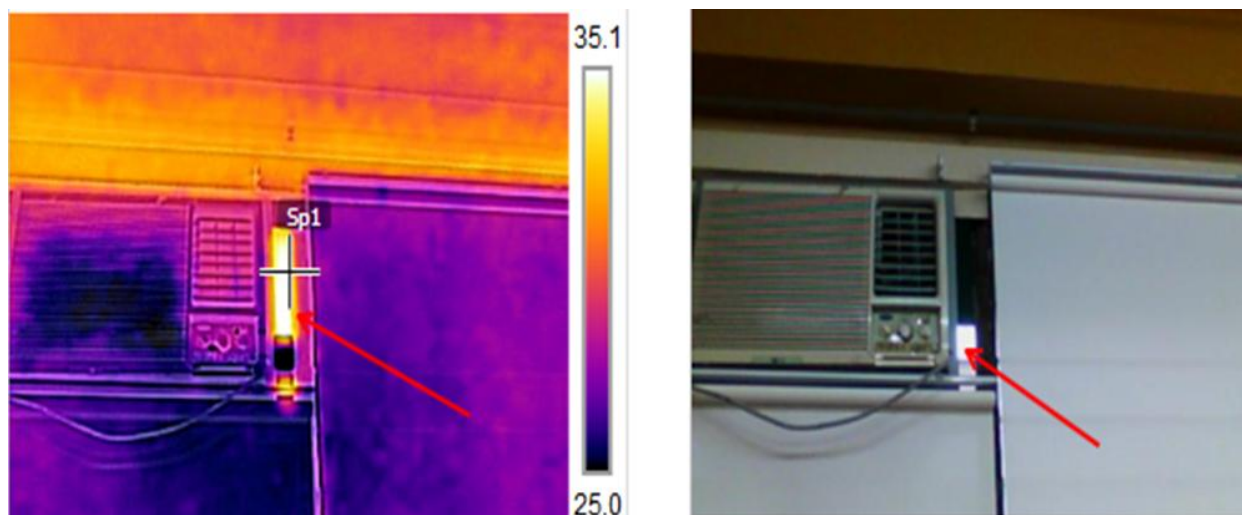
Thermal Infiltration around Window-type Air Conditioner
